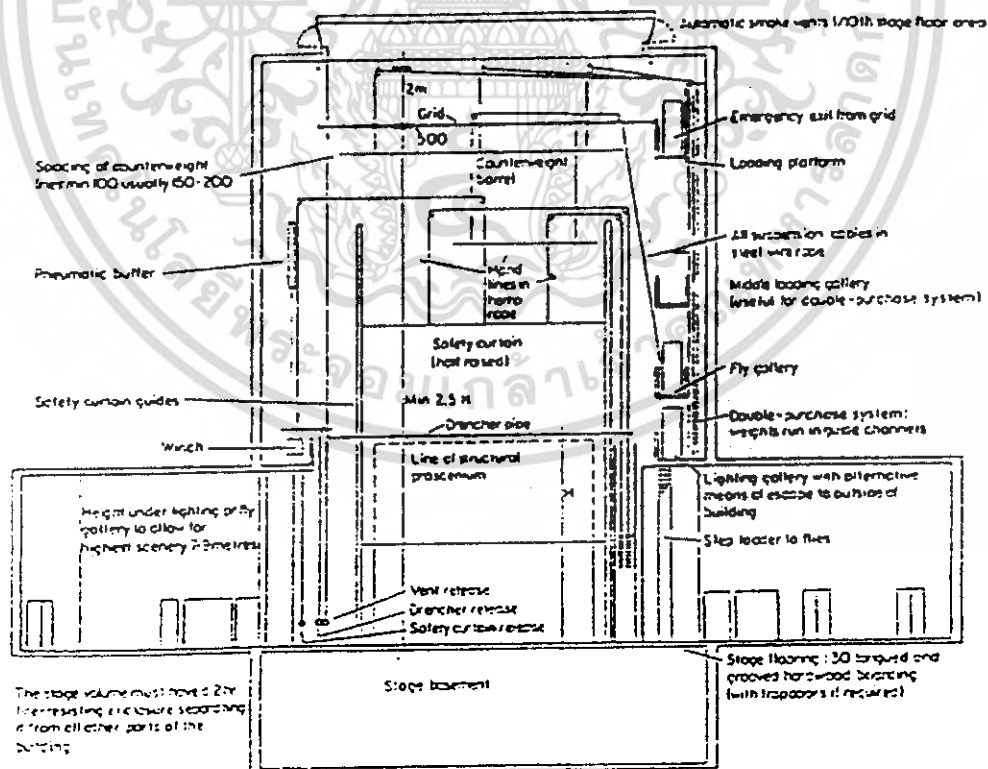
Typical section through stage and fly tower looking towards auditorium
